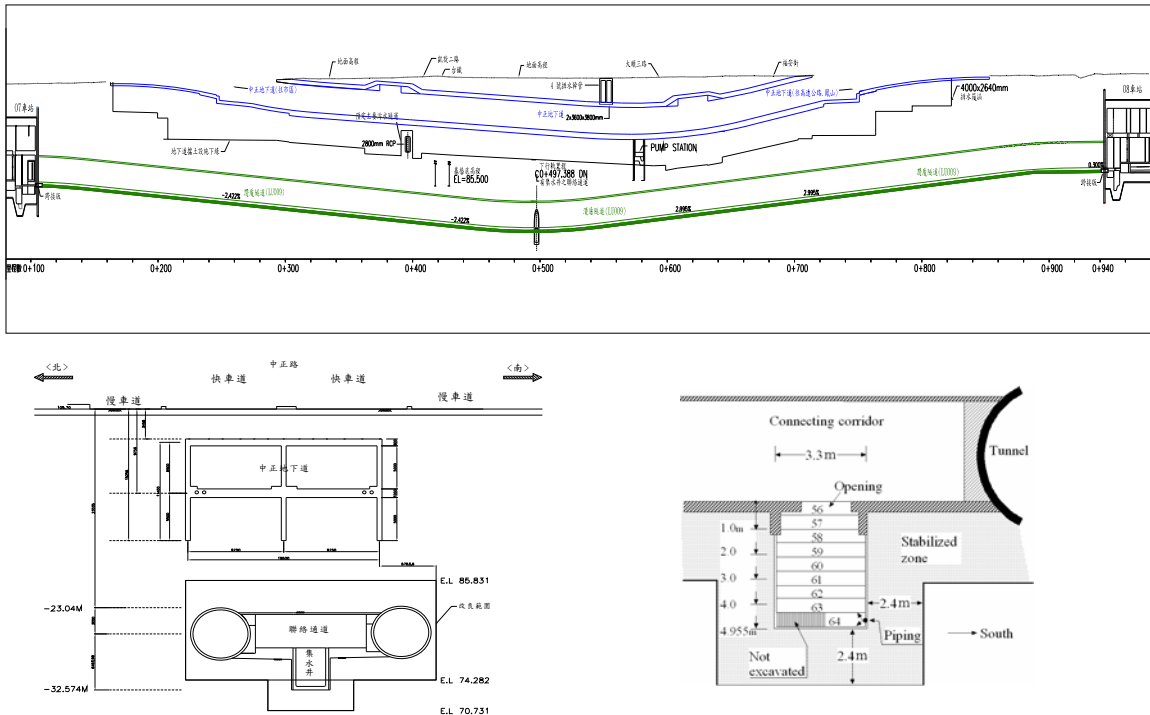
Cross section and side views of the collapsed tunnel site (after TCRI, 2006, Ishihara and Lee, 2008).
